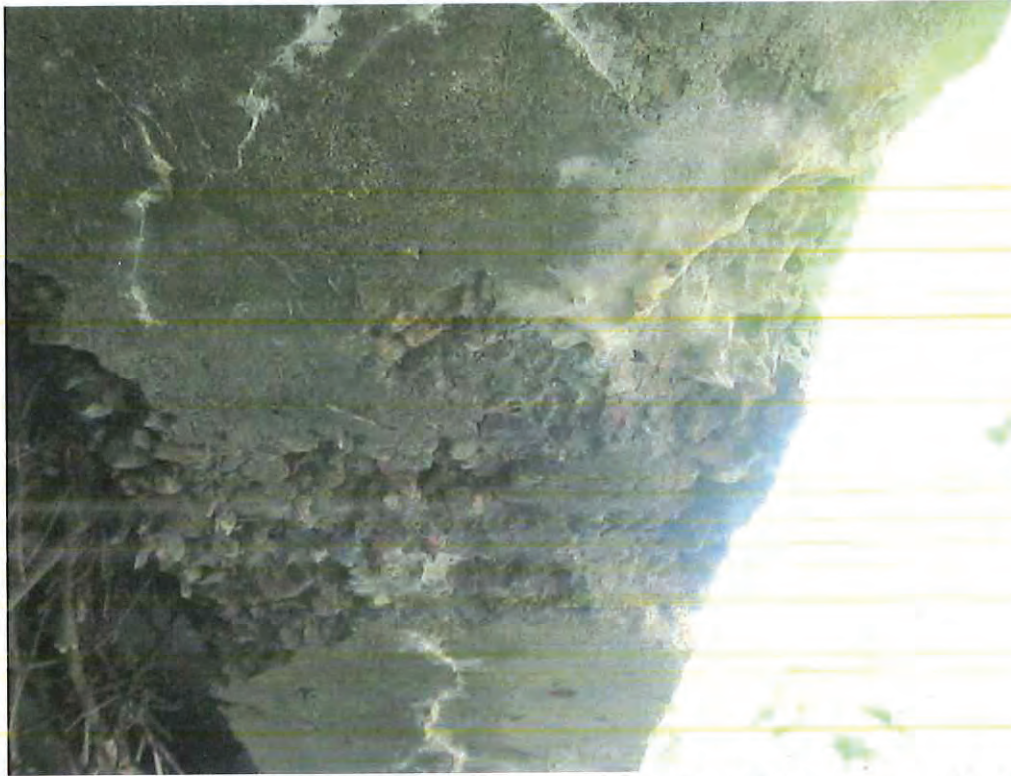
West Transverse Sidewalk Beam, North Face - Up to 2.5in deep edge spall with exposed rebar and adjacent delam. in process of spalling.
